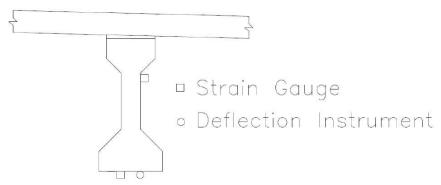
Approximate location of temporary live load instrumentation, girder cross-section
